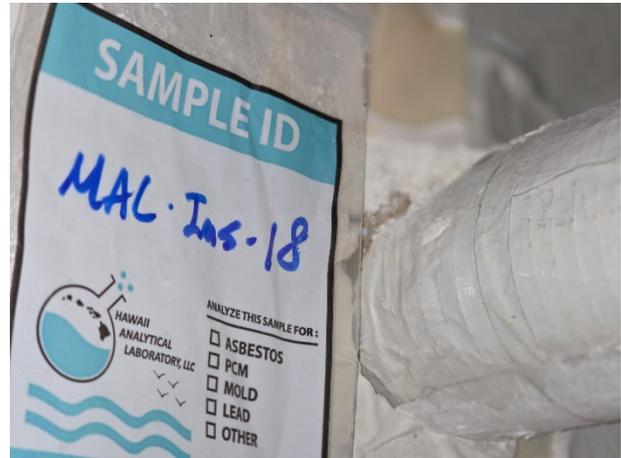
Sample ID: MAL-Ins-18 White joint compound. Above Drop Ceiling. Bathroom.
